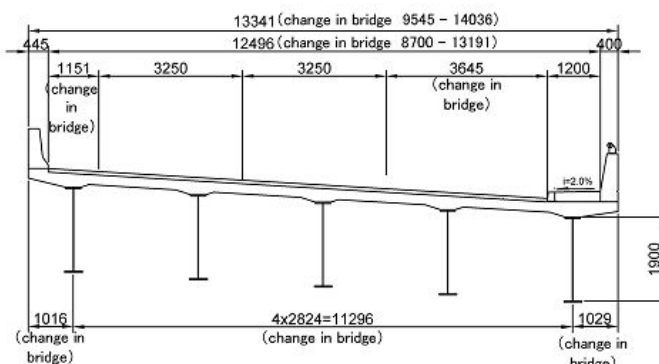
Main Girder Arrangement on Aum Bridge (2)
